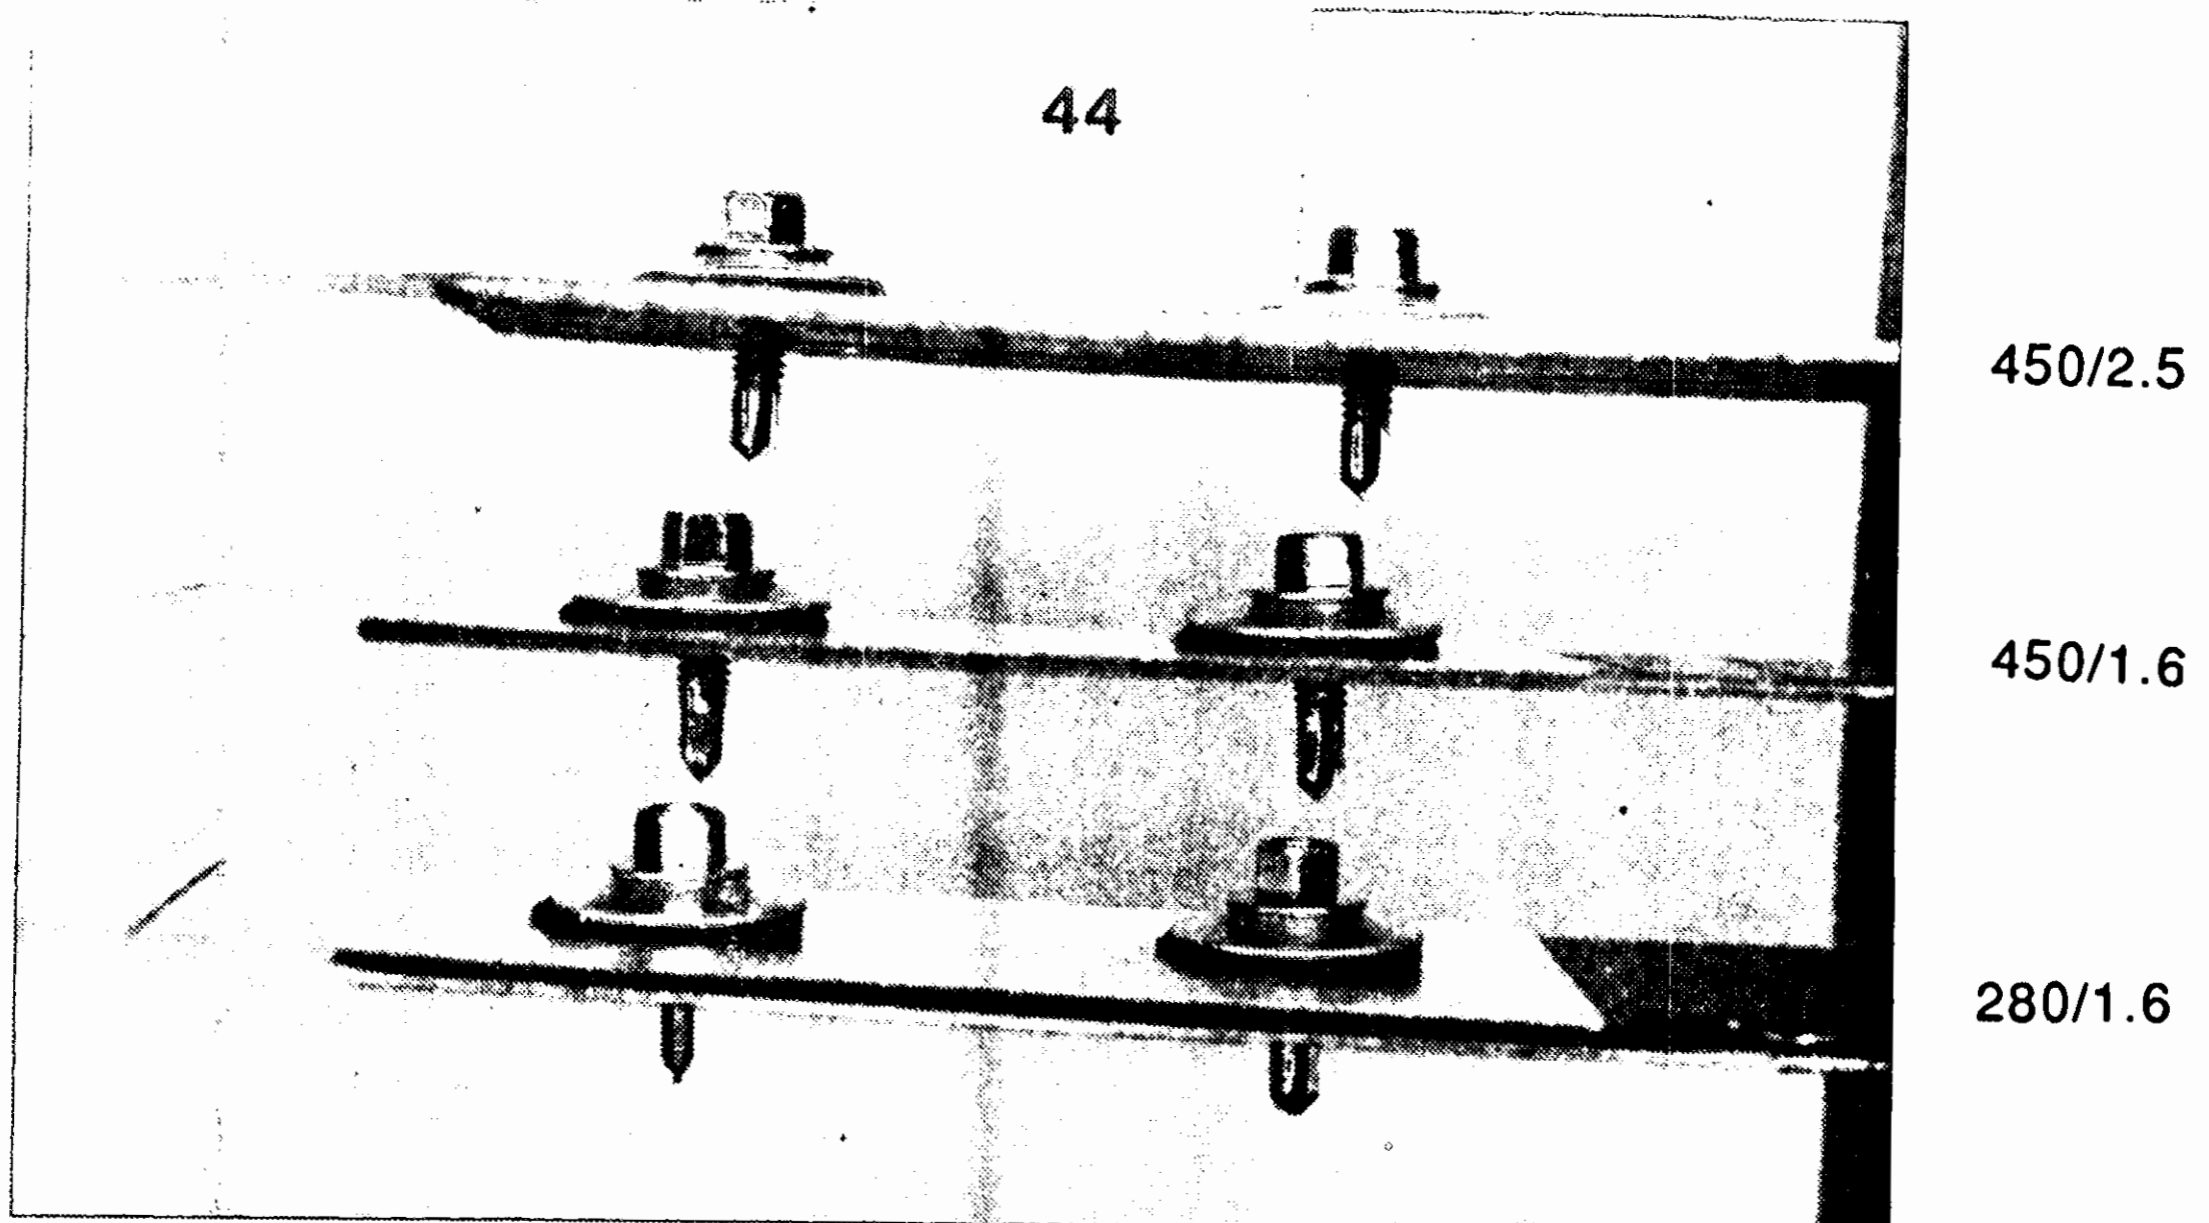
Sheet (0.40 mm)-to-purlin connections (12g emb) after shear tests.
